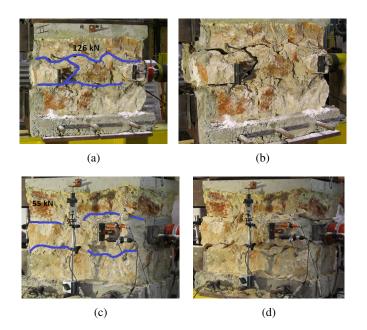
Crack pattern (a) and (c) and Collapse (b) and (d) of masonry specimens: (a) and (b) specimen T1 made with hydraulic mortar; (c) and (d) specimen T7 made with air lime mortar
